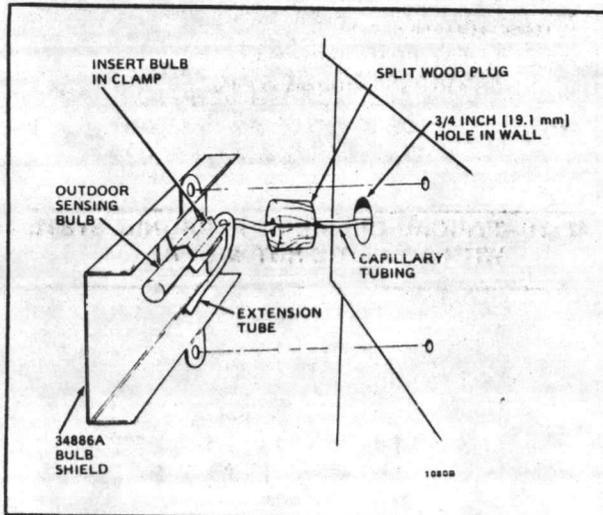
MOUNTING BULB IN SHIELD OUTSIDE BUILDING.
